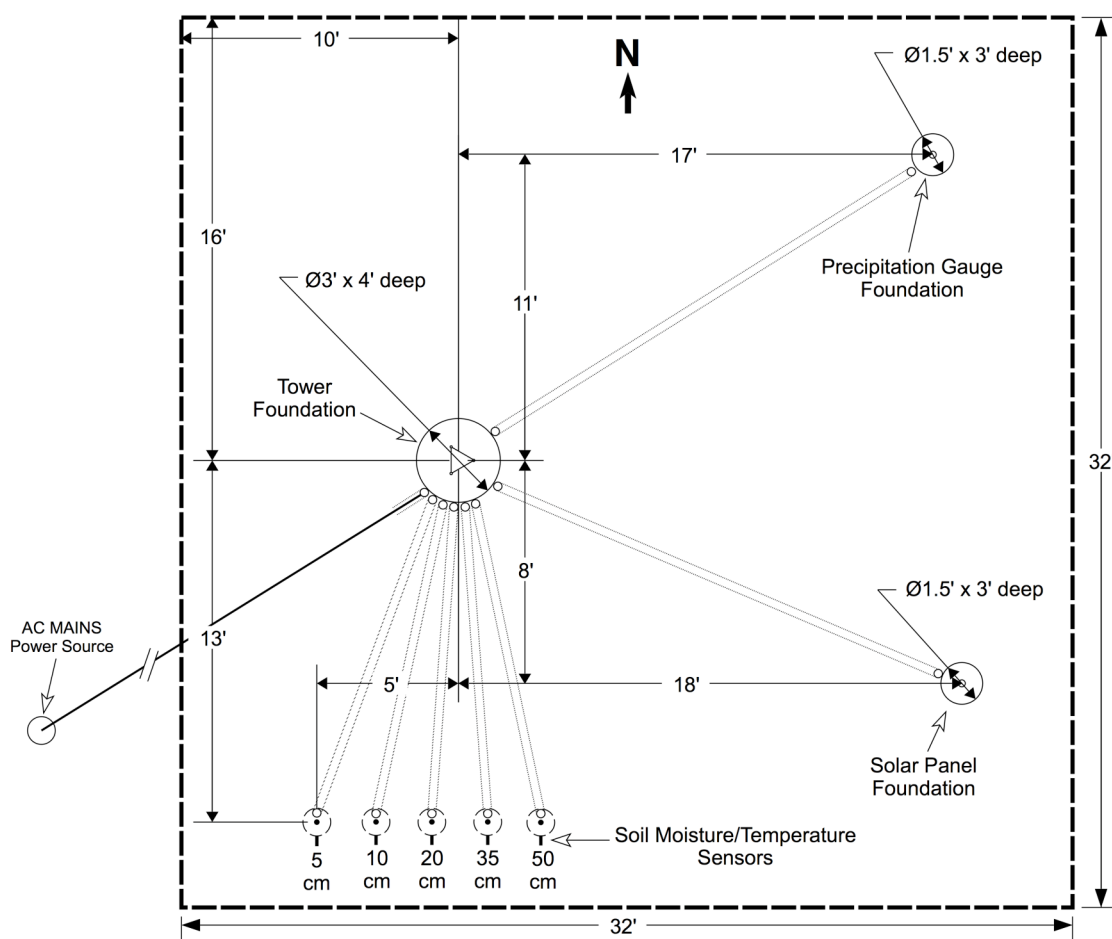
Plan view of a station plot that measures 32-by-32 feet showing the placement of foundations and conduit.
